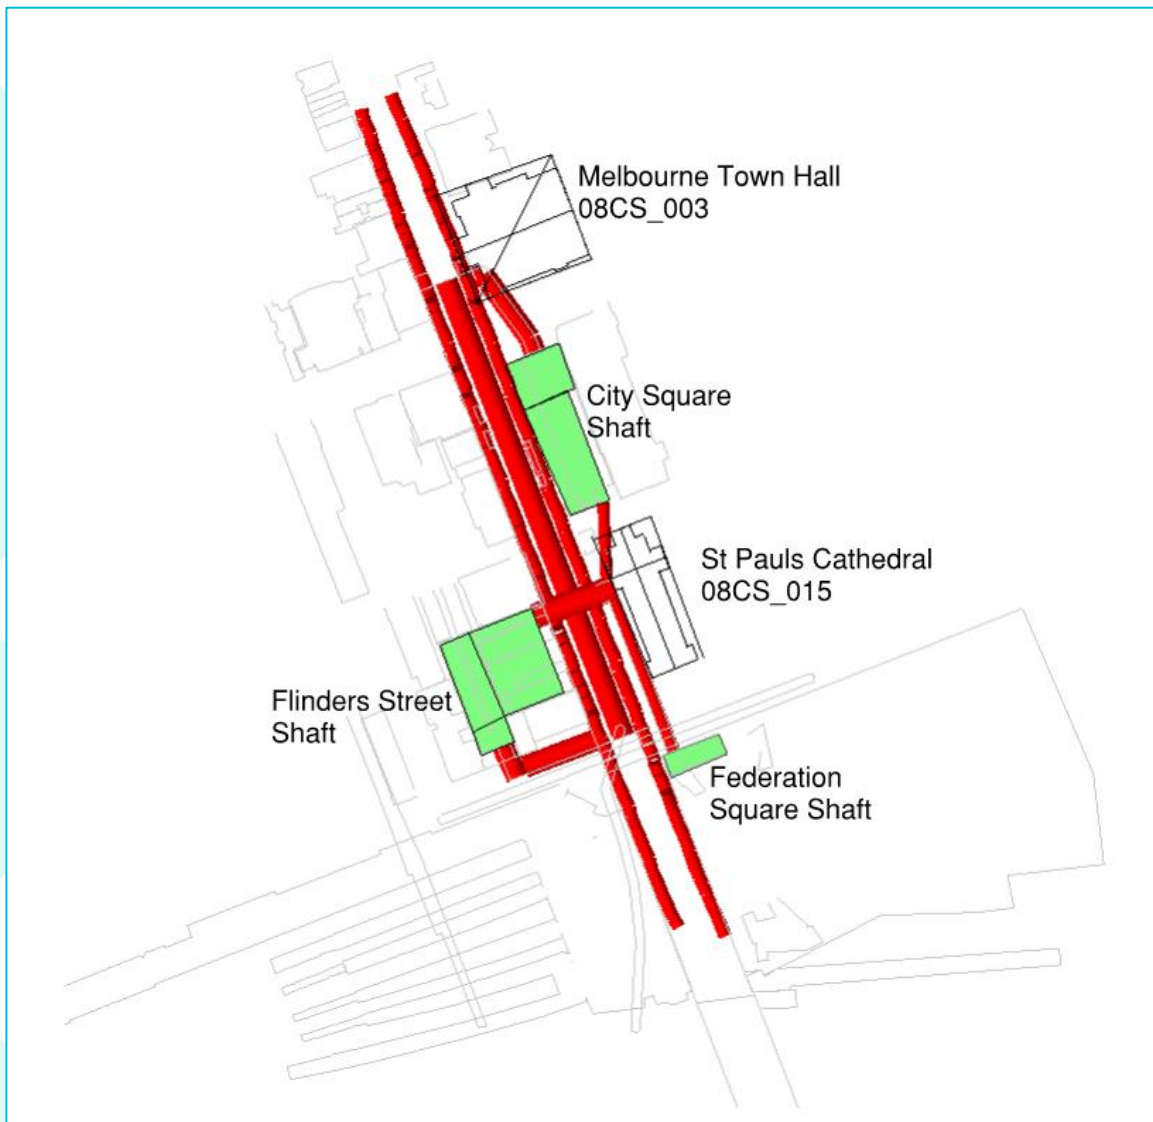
XDISP MODEL OF CBD SOUTH STATION SHAFTS, CAVERNS, TUNNELS AND ADITS USED FOR CALCULATING GROUND MOVEMENTS. THE DARK OUTLINES FOR TOWN HALL AND ST PAULS CATHEDRAL ARE THE LINES USED FOR ASSESSMENTS OF BUILDING DAMAGE.
